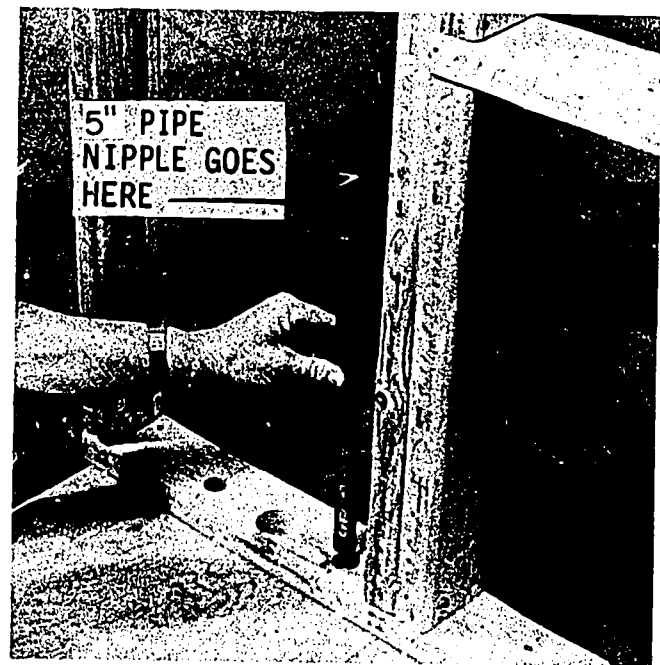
Inserting Pipe Length Through Pipe Hole in Sole Plate
